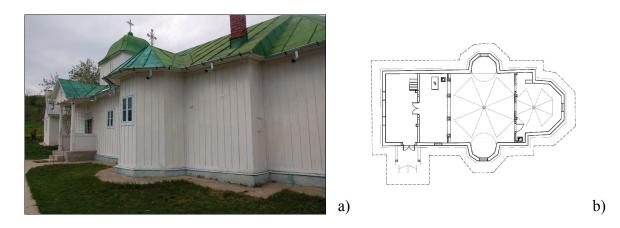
a) Vorovesti Church b) Plan of the Vorovesti Church (photo and drawing by A. Cehan)
